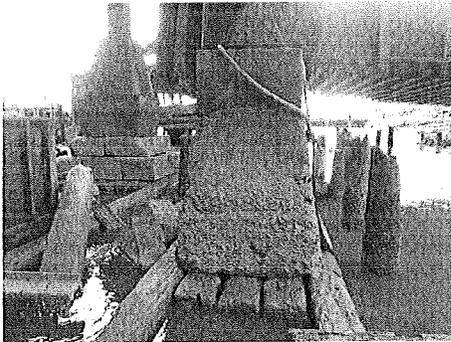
Pedestal # 13 with heavy scaling and some spalling, grillage in poor condition and heavy debris, looking south.
